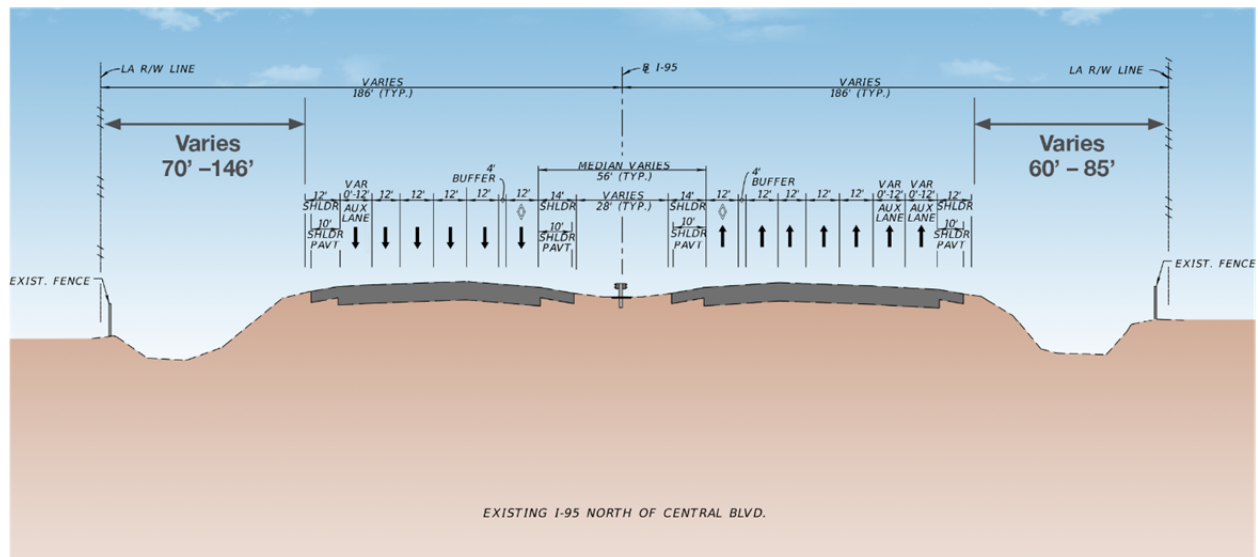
Existing I-95 Roadway Typical Section – North of Central Boulevard
